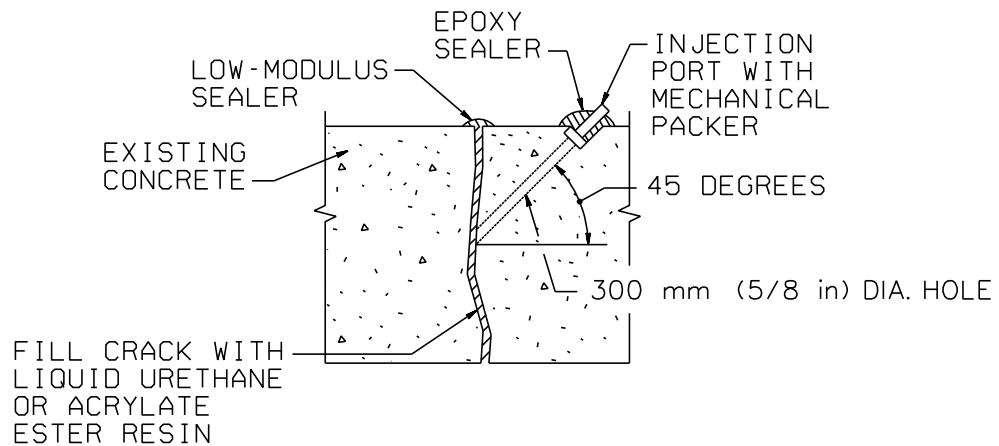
Section 1-1 – Leaking Crack Repair Detail (For Leaking Crack, Vertical Surfaces) (FHWA, 2005)
